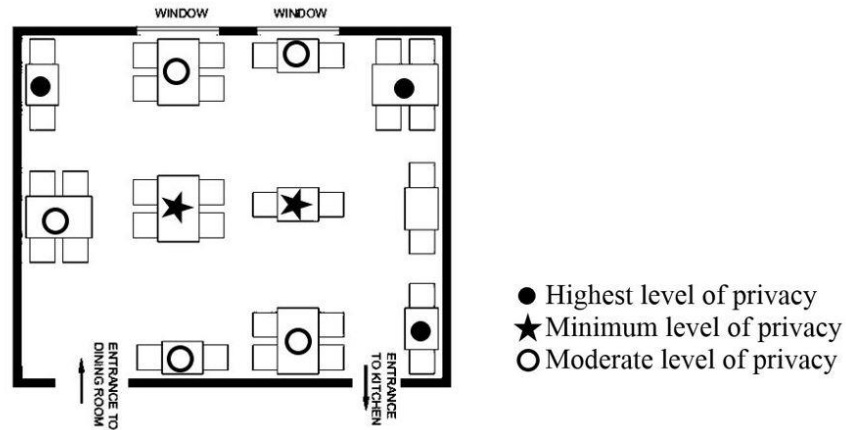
Hypothetical architectural layout proposed by (Robson, 2008), legend added by author
